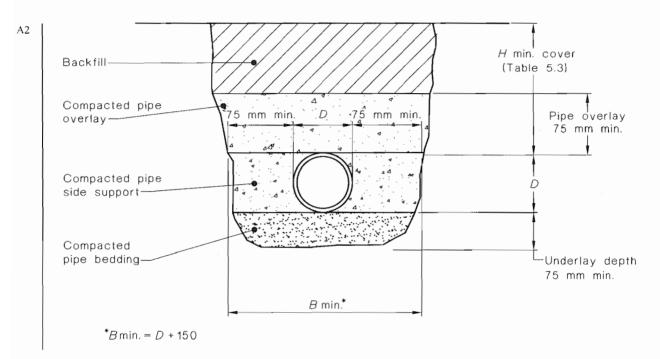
TYPICAL INSTALLATION IN A TRENCH
